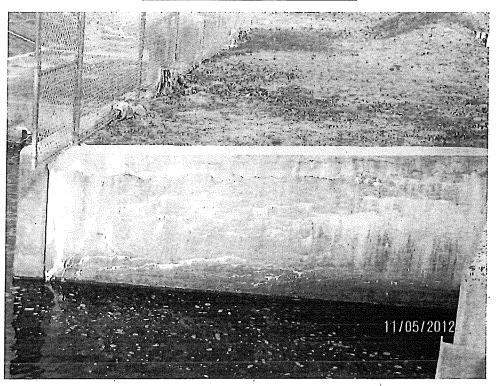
Map cracking and concrete repair to the Northeas't wing/retaining wall.
